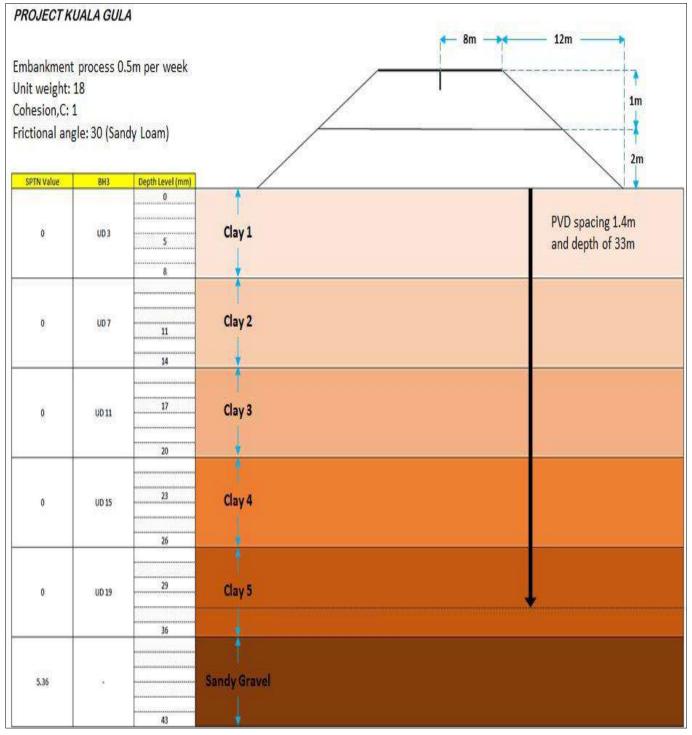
Subsoil profile and ground improvement work model (Case 3)
